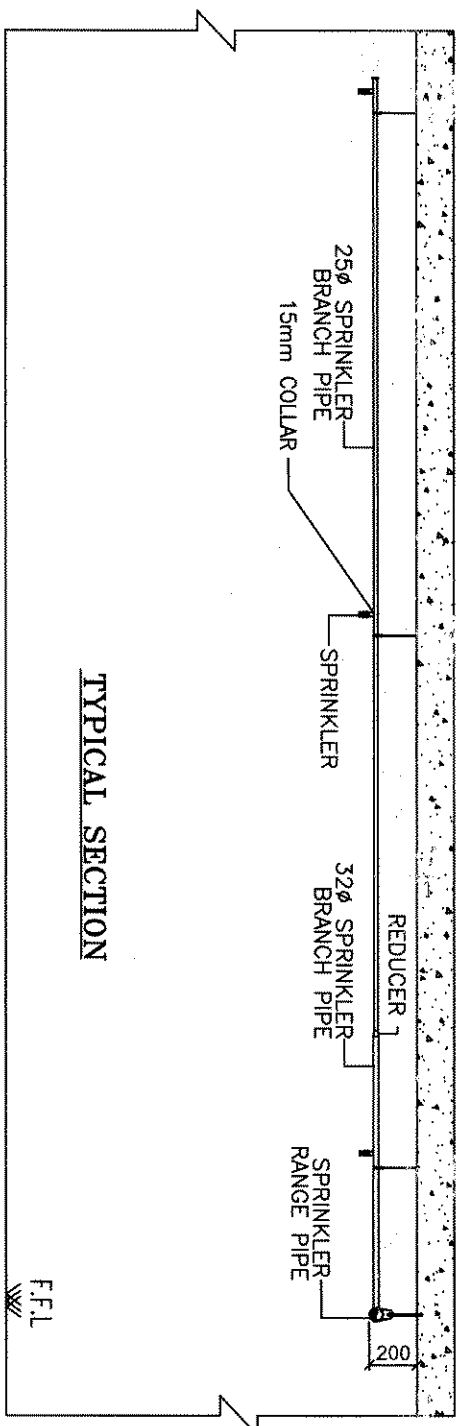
DETAIL FOR HORIZONTAL SIDEWALL SPRINKLER
